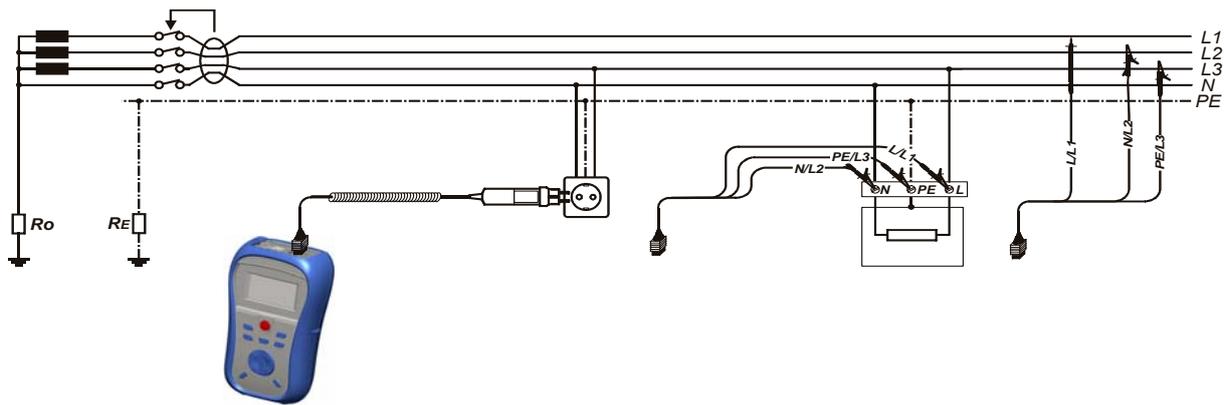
Connection of plug cable and universal test cable in single-phase system
